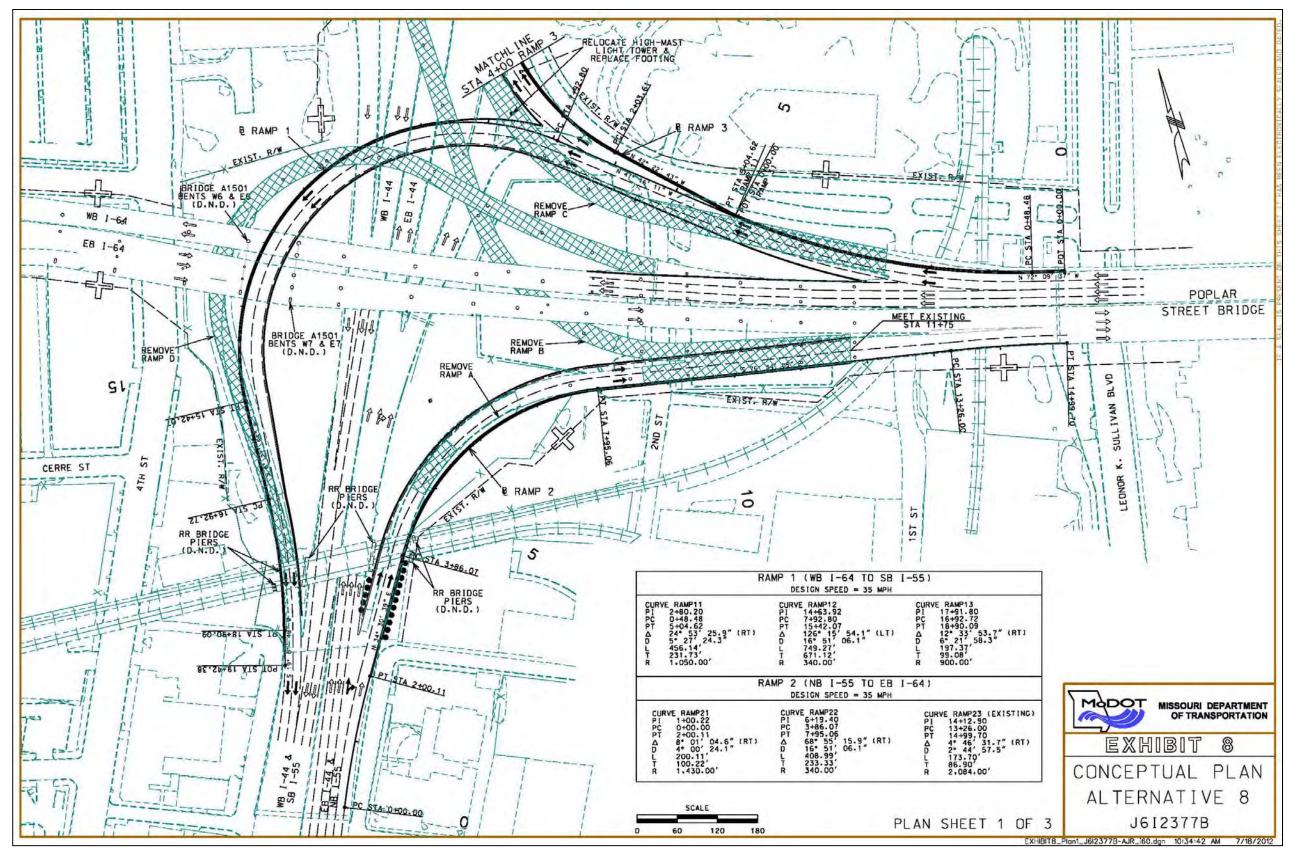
A: PSB Interchange Reconstruction Alternative 8, Sheet 1
